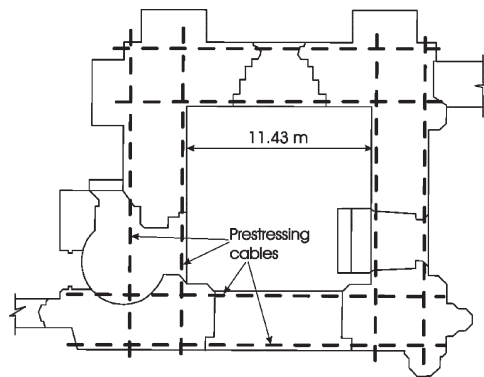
Plan of Silverdale church tower showing strengthened areas (Redrawn from Reference 24)
